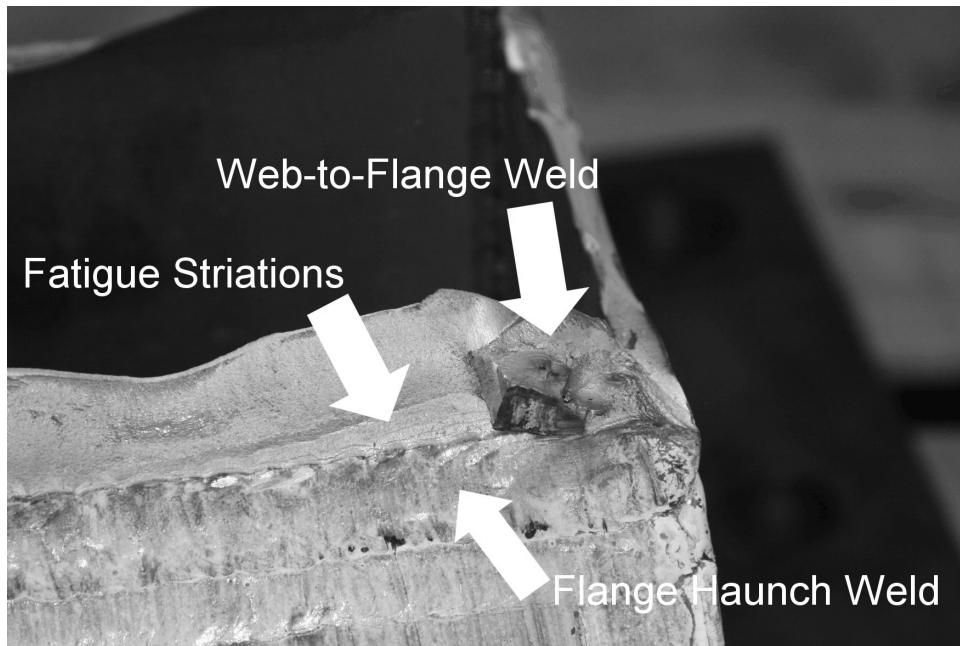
Fracture Surface of Top East Flange of Specimen X3L1.2
